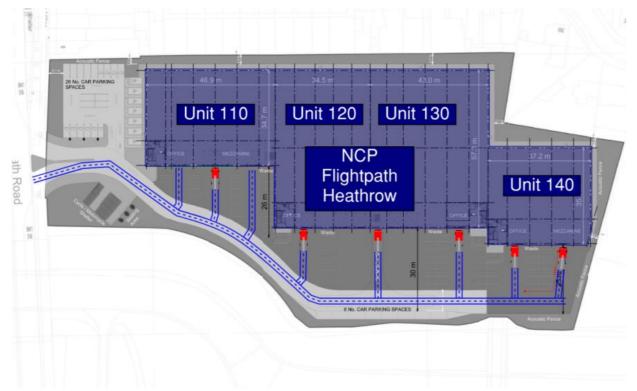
Fire Service site access – parking positions (fire appliances to scale with drawing)
